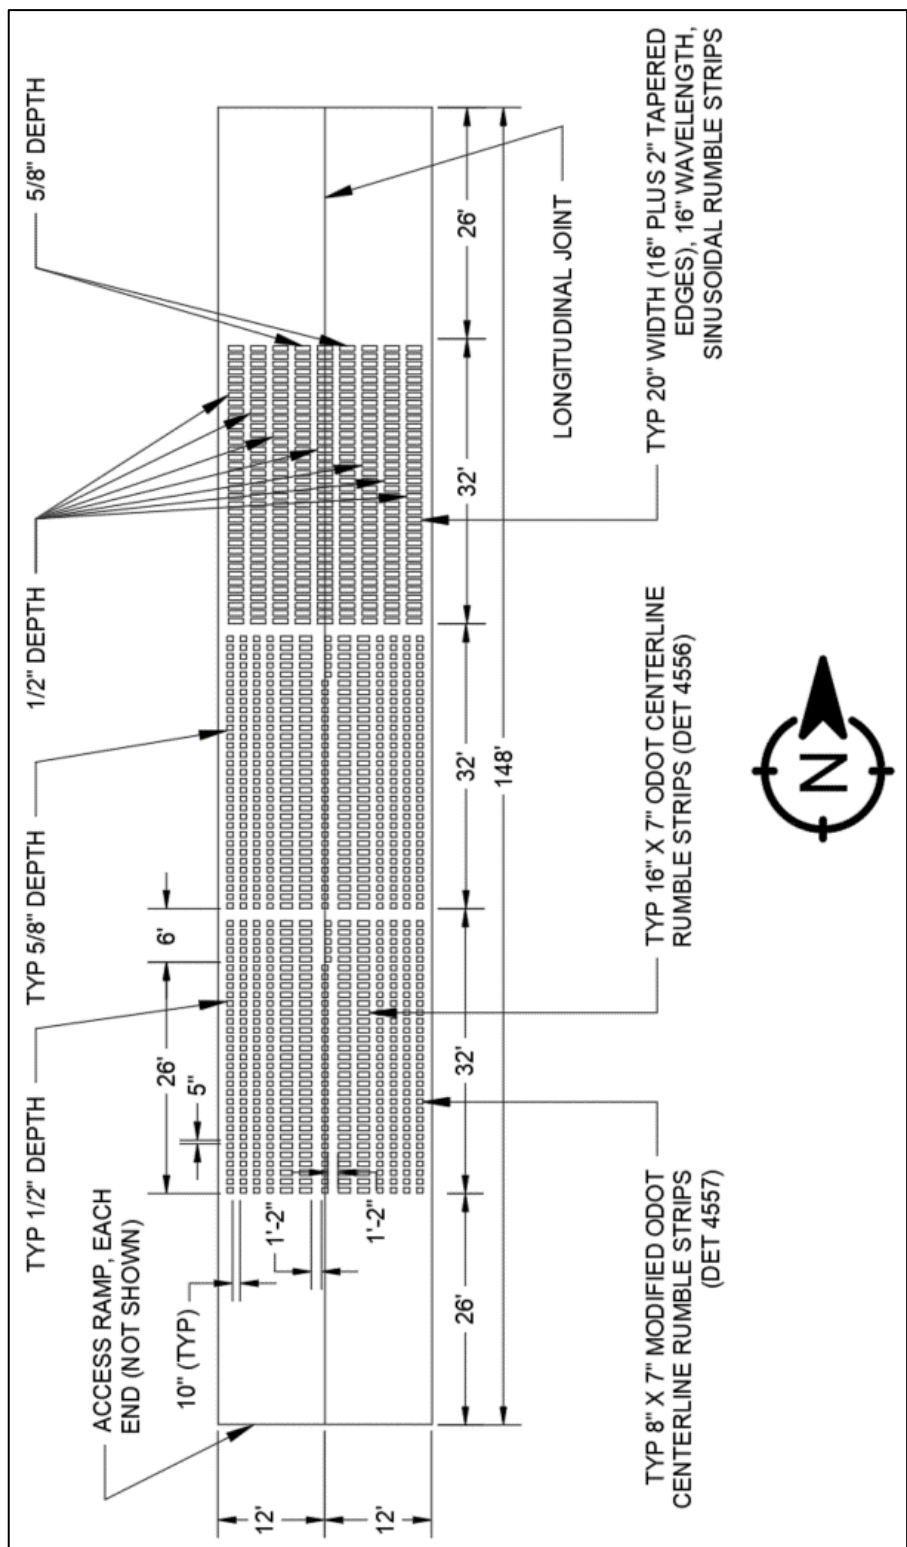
CLRS installation plan at the test strip (" corresponds to inches and ' corresponds to feet)
